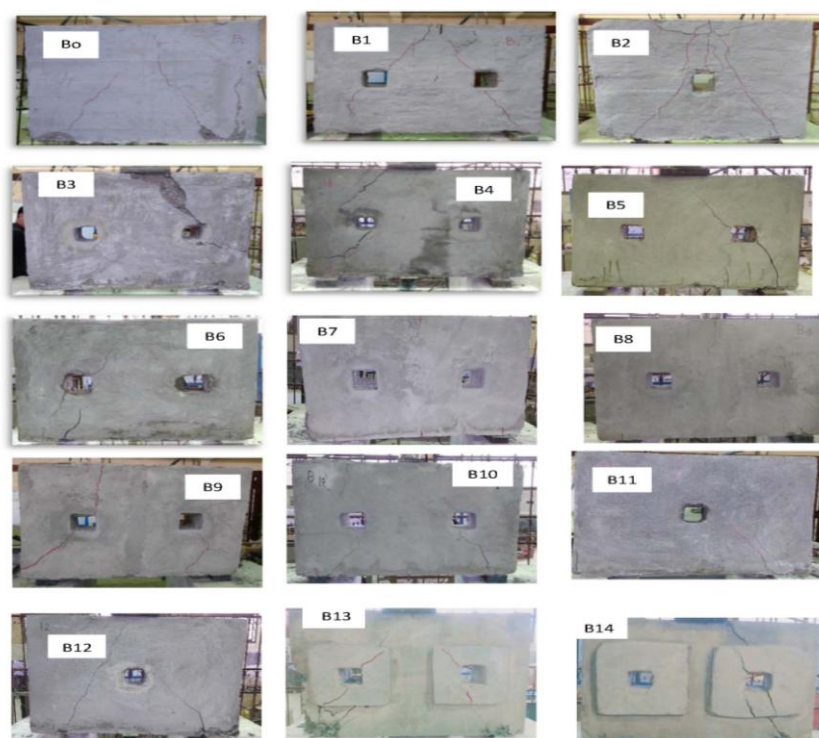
CRACKING PATTERN OF THE TEST SPECIMENS.
